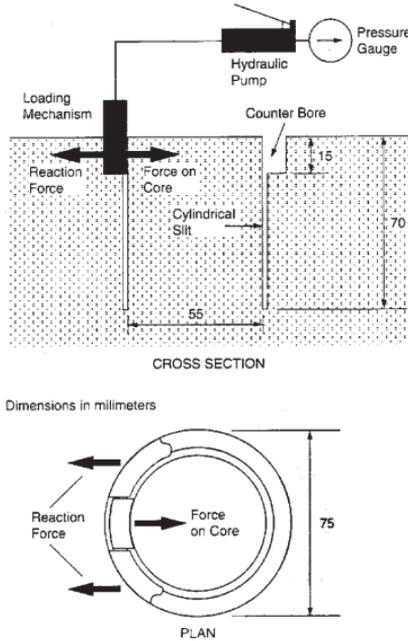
Schematic dig. of BO concrete specimen
